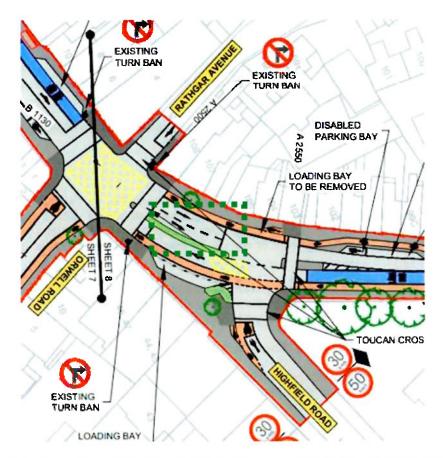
Extract from Sheet 11 of the General Arrangement drawing illustrating the intersection of Terenure Road East and Rathgar Avenue/Orwell Road and Highfield Road. Queue area for Highfield Road in green dashed line.
